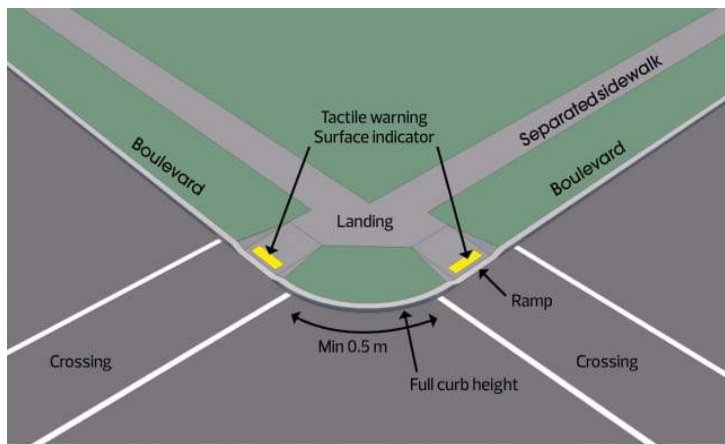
Perpendicular Curb Ramps Boulevard Separated Sidewalk
